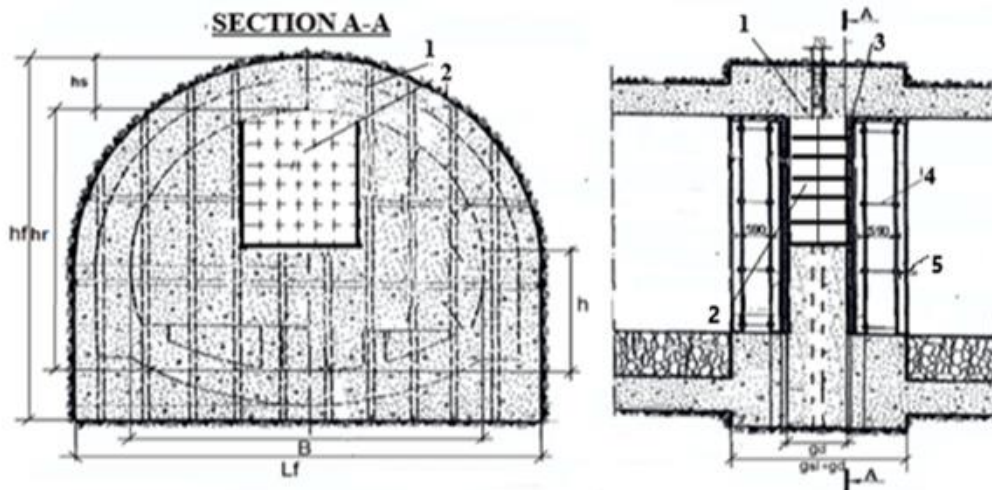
Construction of a retaining dike for backfilling shafts /3/
